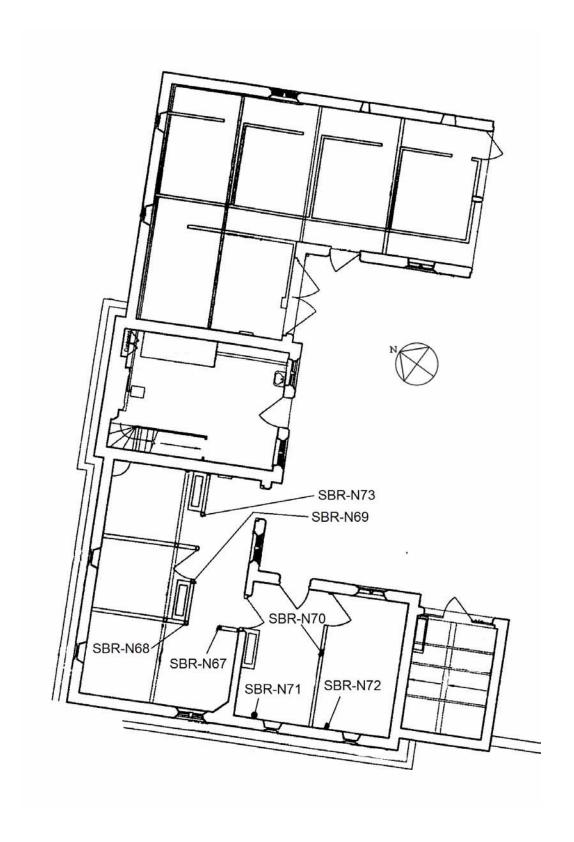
Ground-floor plan of the coach/mash houses and stables, showing the location of samples SBR-N67–73
